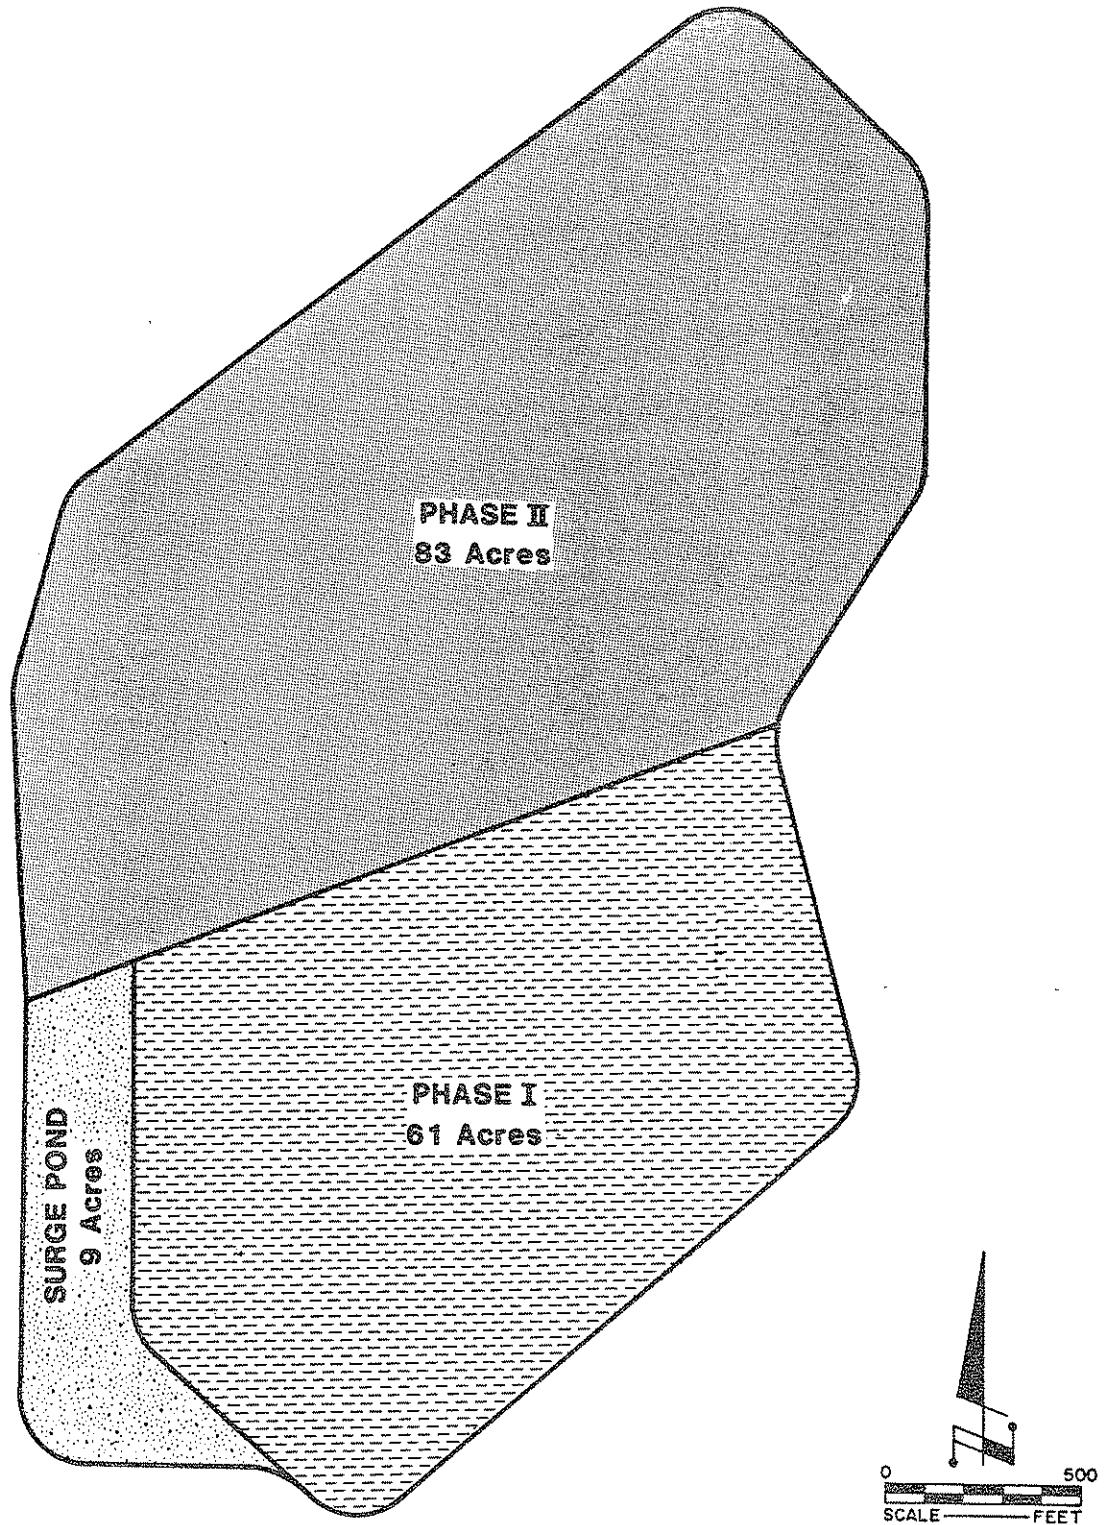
Schematic Layout of Wet Stacking Disposal Facility
